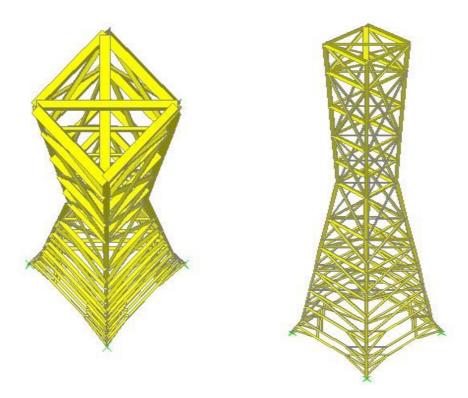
The plans of render view of the tower. Fig 1.3 Elevation of tower
